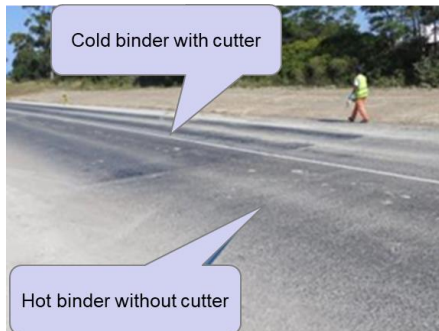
Bleeding and Fattiness on a Cape Seal due to Solvents in the Tack Coat
